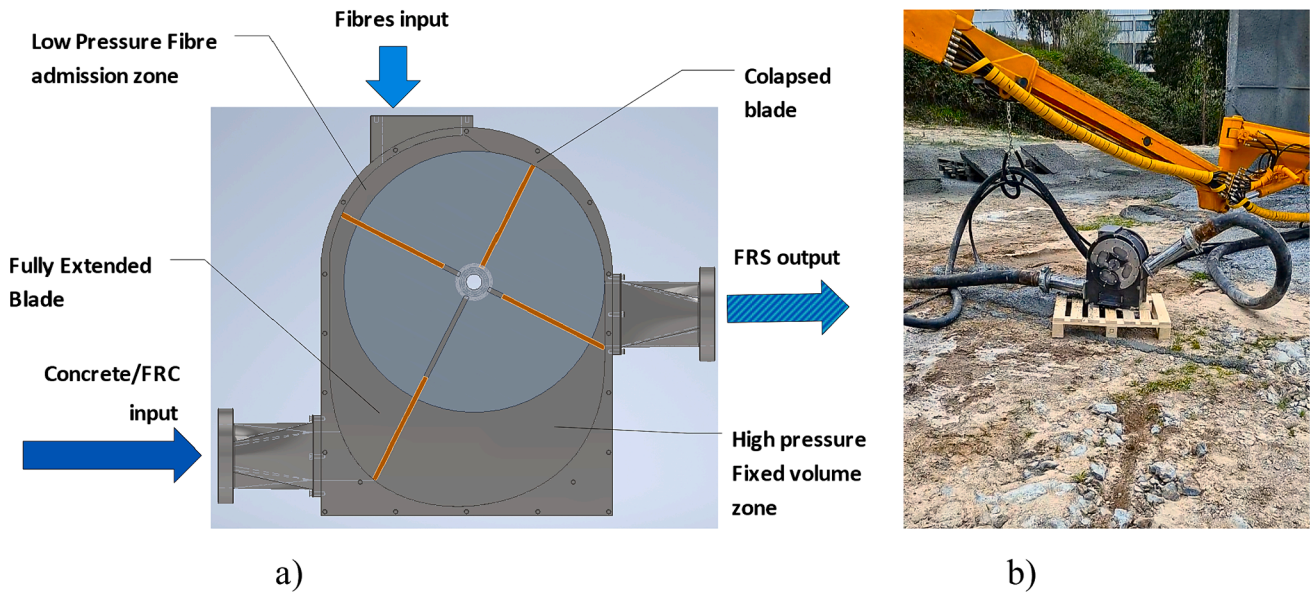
Self-propelled system: a) concept, b) first built prototype being tested.
